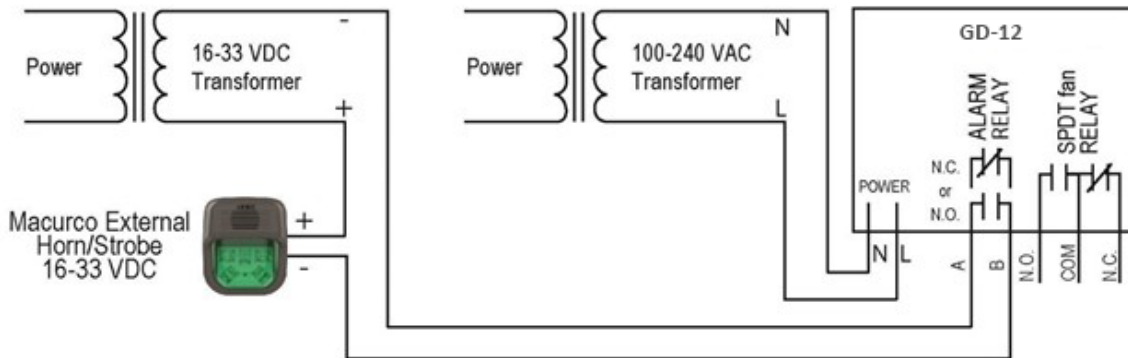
12-Series Horn & Strobe Combo Wiring
